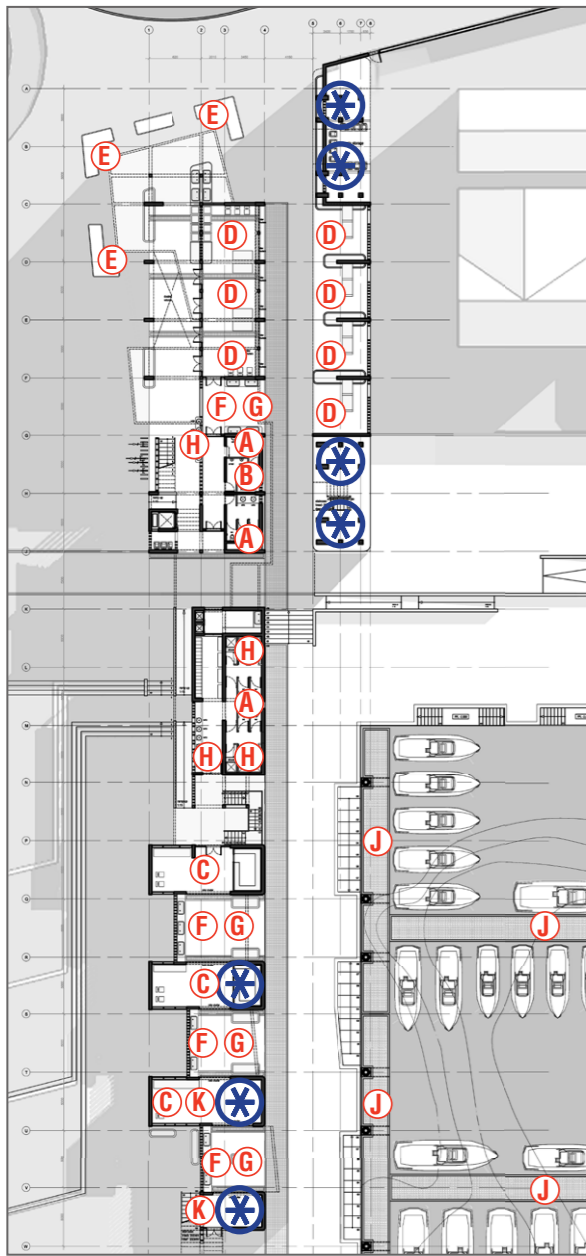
Ground floor plan showing position of water treatment and use processes
